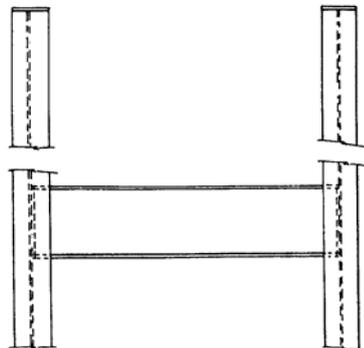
Beam framing into minor axis of columns that will create difficulties in erection
